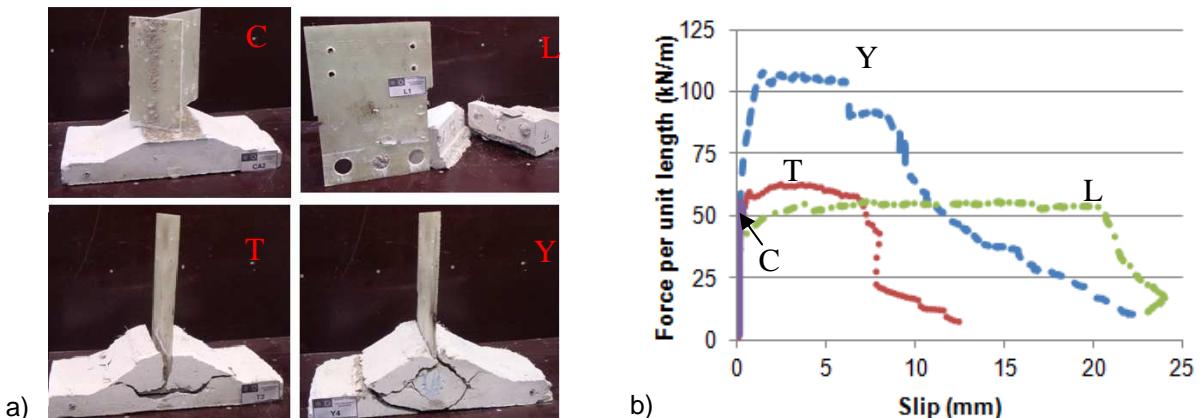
Pull-out test results: a) typical failure mechanisms, b) load-slip curves.
